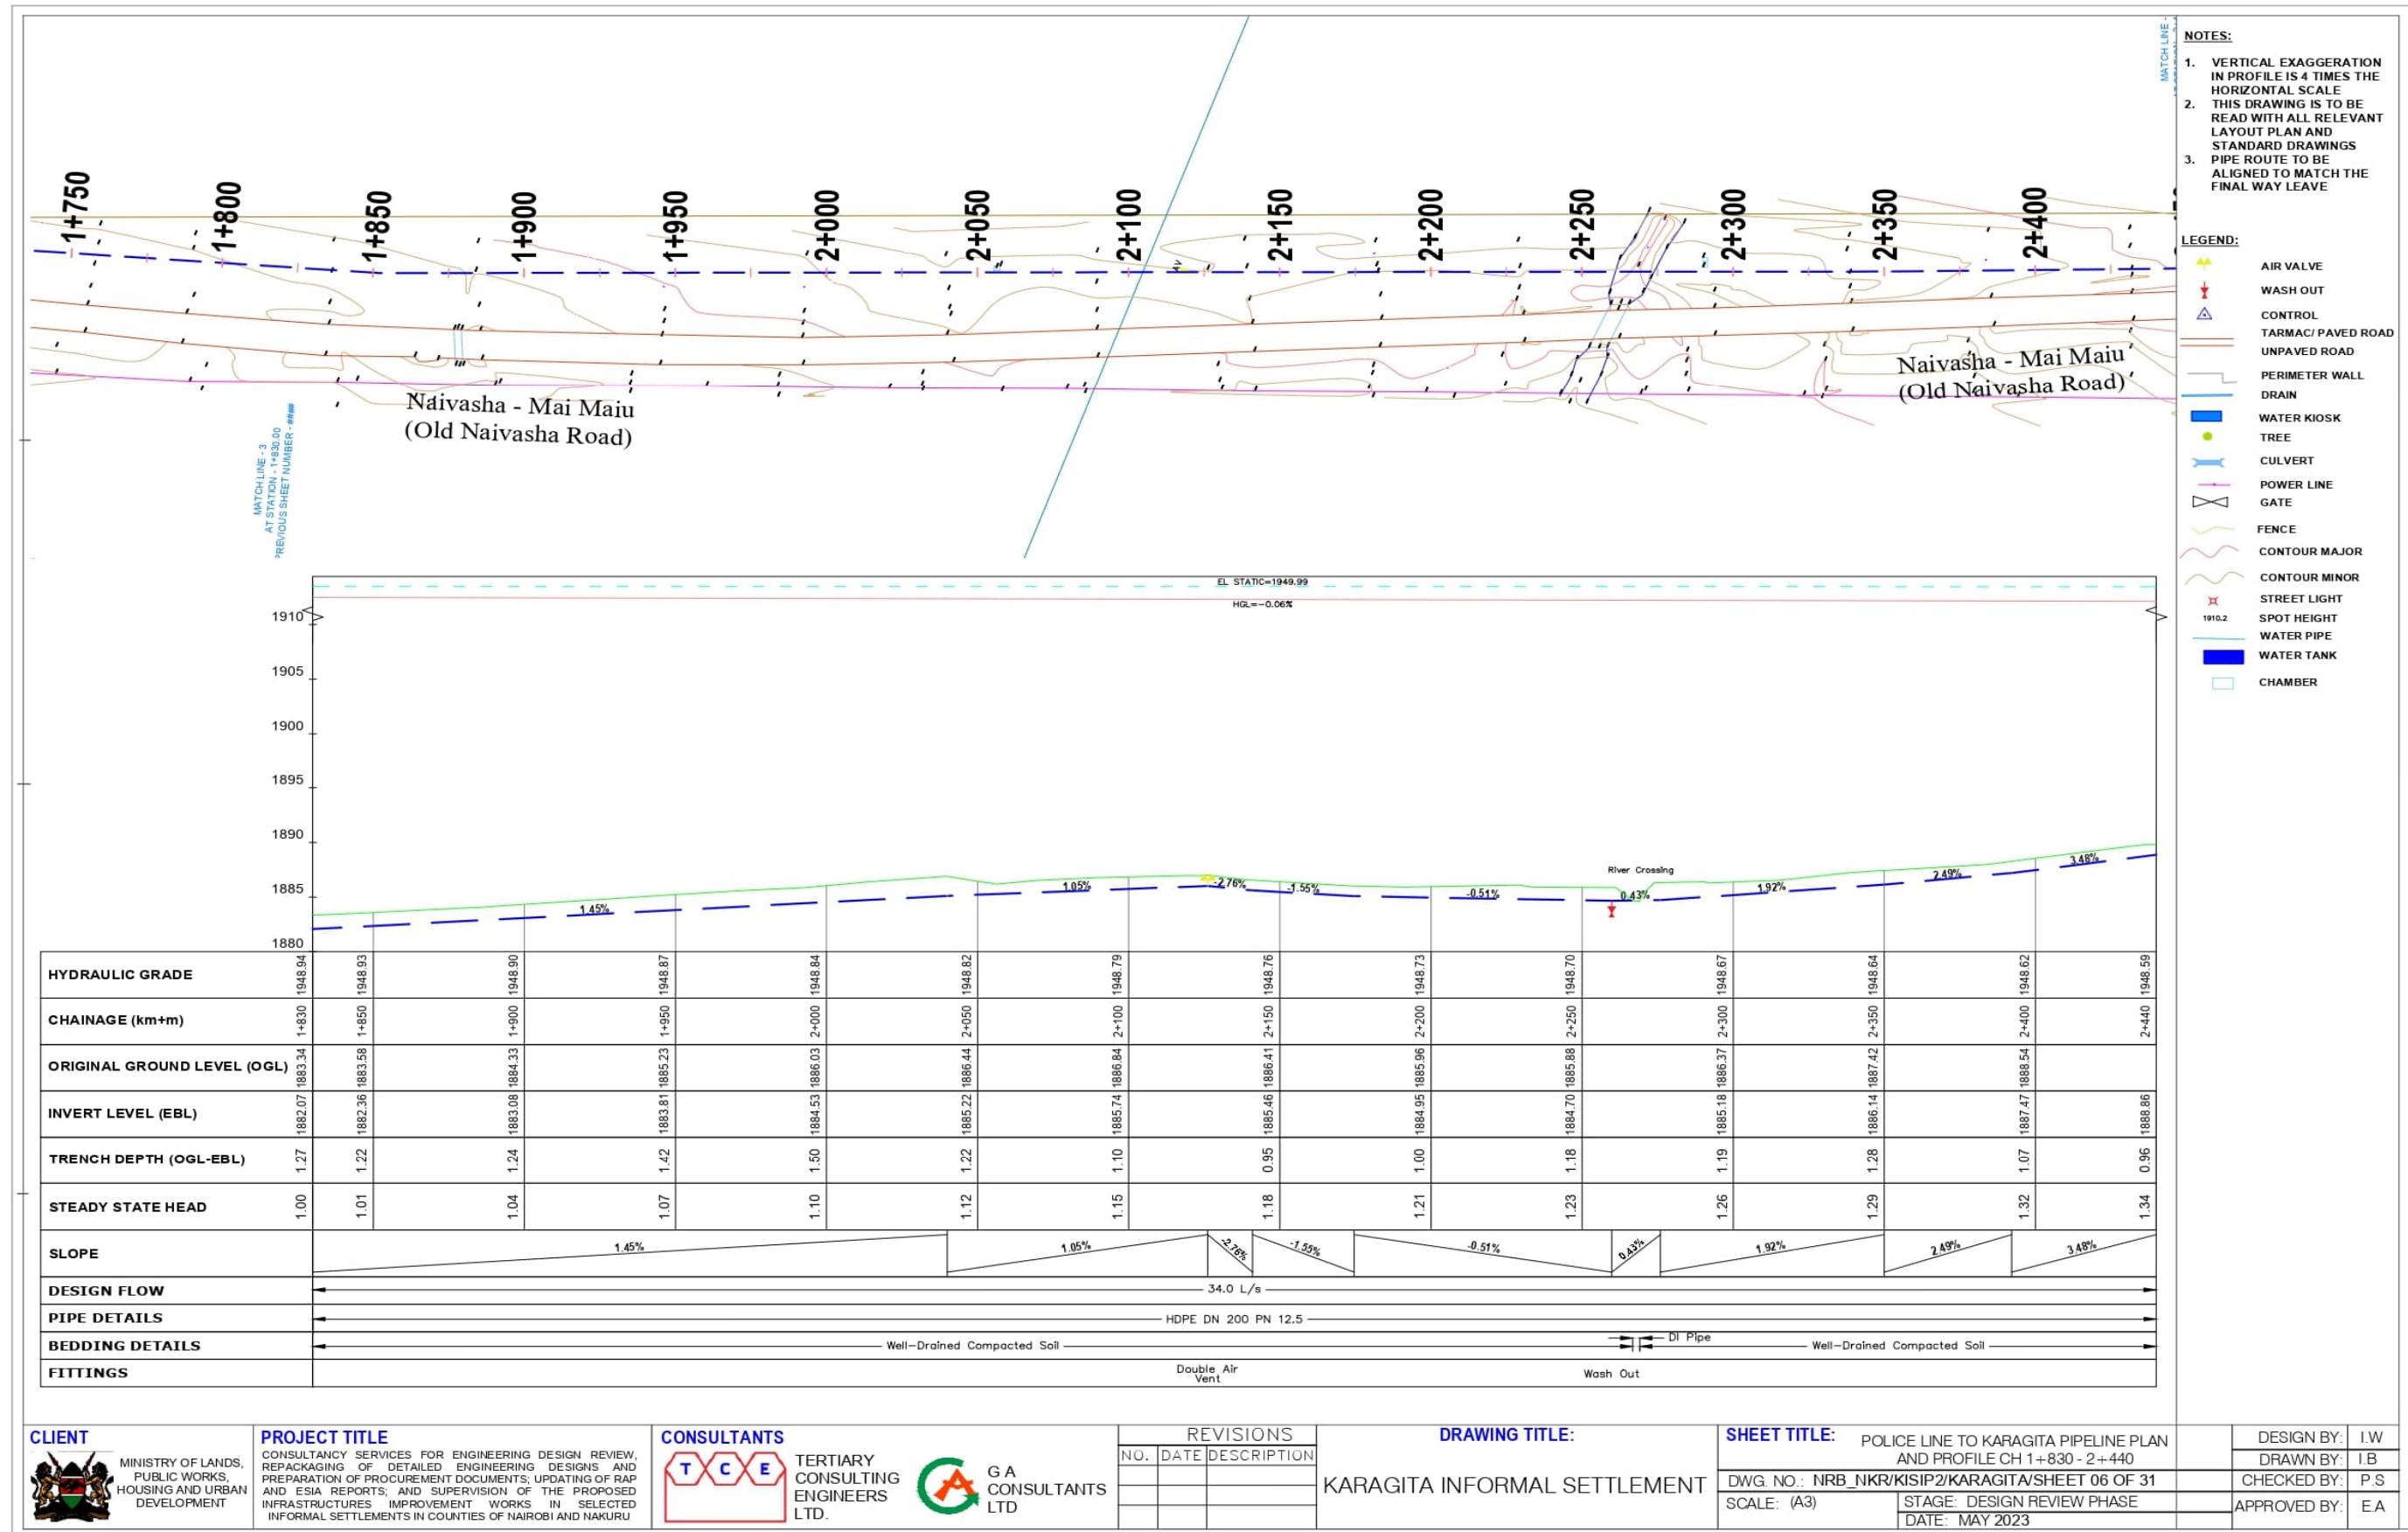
Karagita Design Engineering Layout Plan (4)
